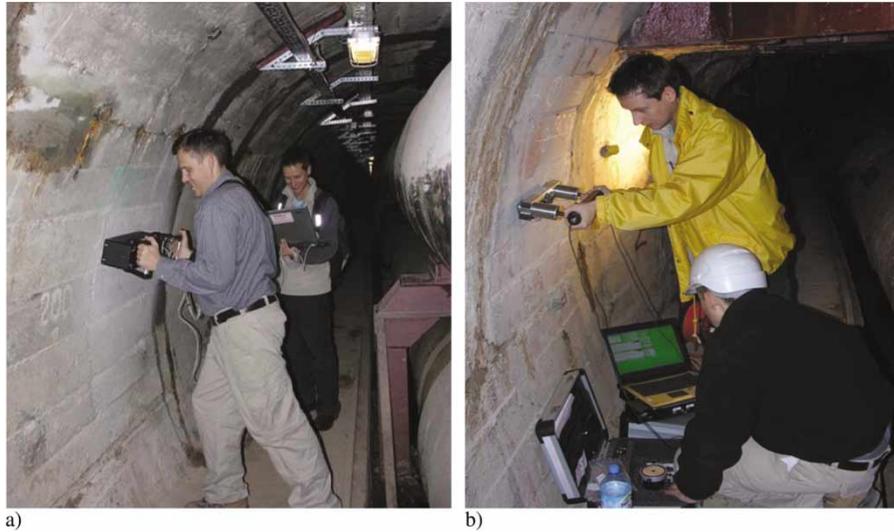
Testing by: (a) ultrasonic tomography technique; (b) impact-echo technique
